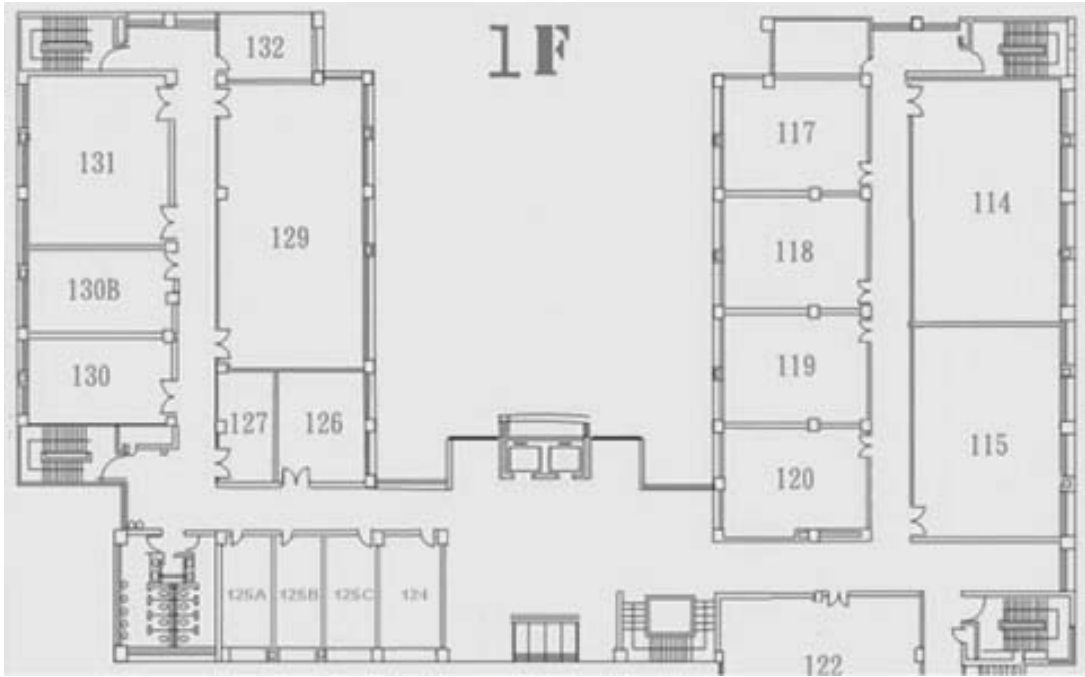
The 1F plan of Engineering Building 3 in NCTU.
